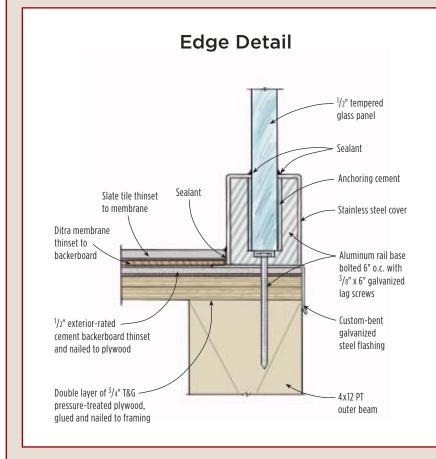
After the cement board was installed, the glazing contractor bolted the aluminum base shoe (above left) over a galvanized flashing at the edge of the deck (left). Later, when the tile had been set, he cemented 1/2-inch tempered-glass panels into the channel, then clad the channel with a stainless steel cover (above).
